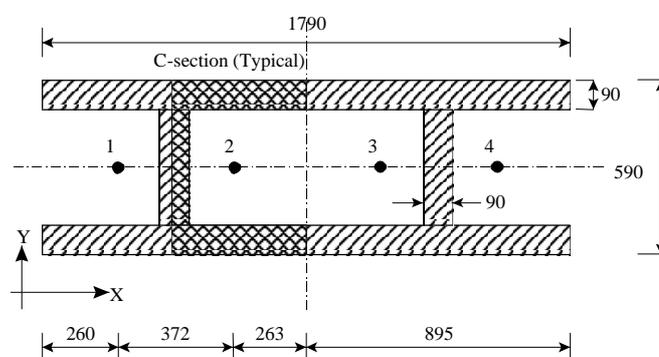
Cross-section dimensions of the diaphragm wall. Measurements in millimeters (Sayed Ahmed et al. 1999)
